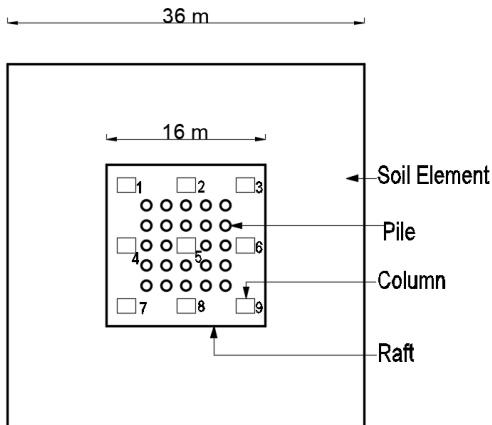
Position of Piles in Piled Raft Foundation-Type E- Pile at one-third of bay + pile at column center-line (24 Nos. of Piles)
